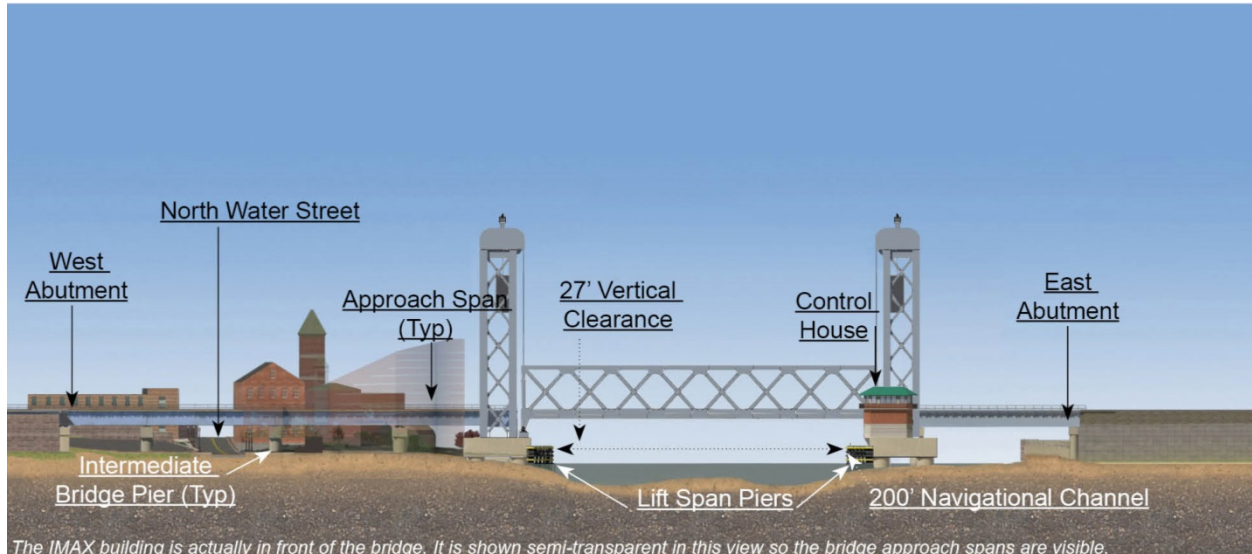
Elevation View of the Long Span Vertical Lift Bridge (Option 11C)
